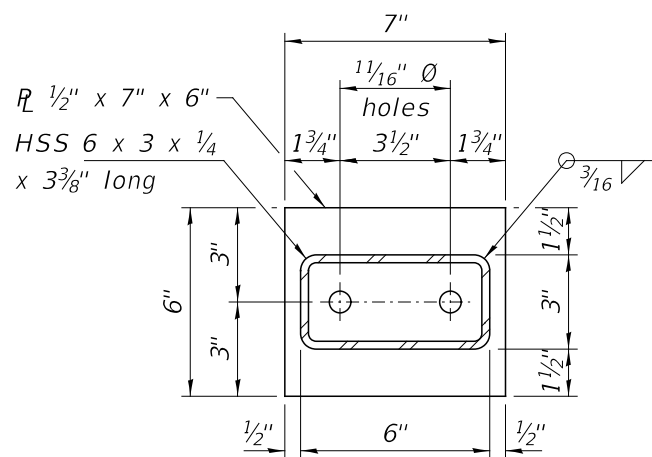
Type SMX Rail Retrofit on PPC Deck Beams
